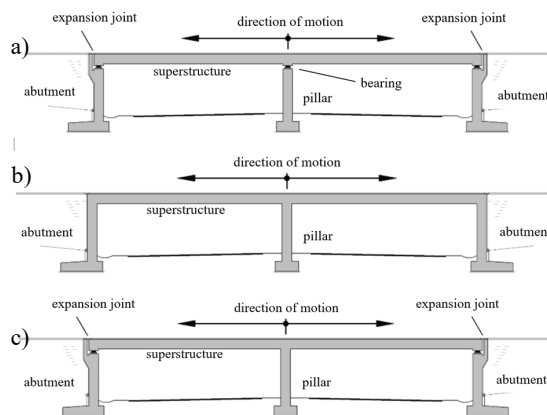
Bridge construction concepts a) standard bridge superstructure with bearings and expansion joints, b) integral bridge with monolithic connections of superstructure, pillar and abutments, c) semi-integral bridge with rigid connection at the middle pillar
